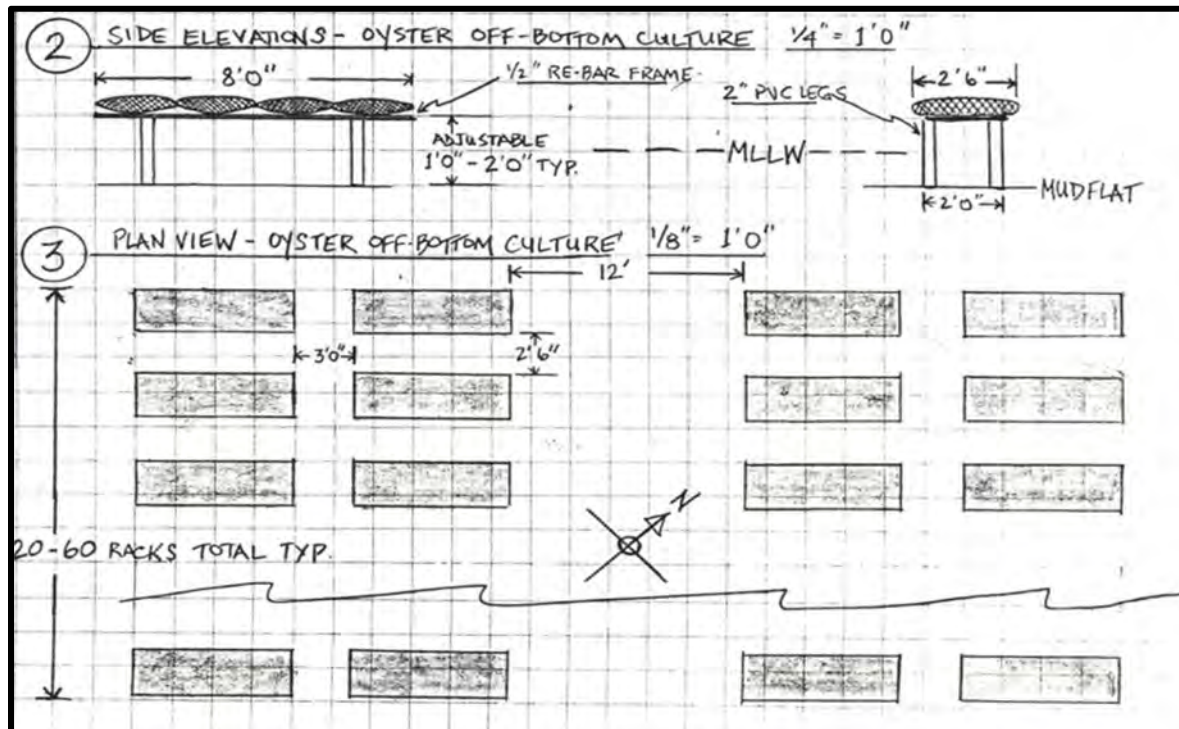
Typical Off-Bottom Racks-on-Pipe Layout
